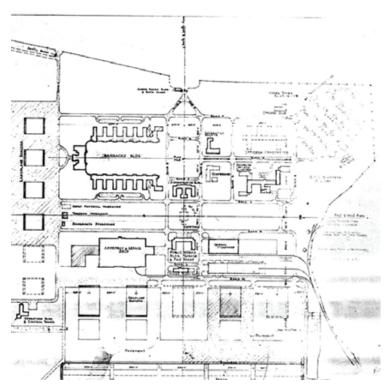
1940 plan of NAS Alameda. Courtesy of Department of the Navy, NAS Alameda Plan Room
